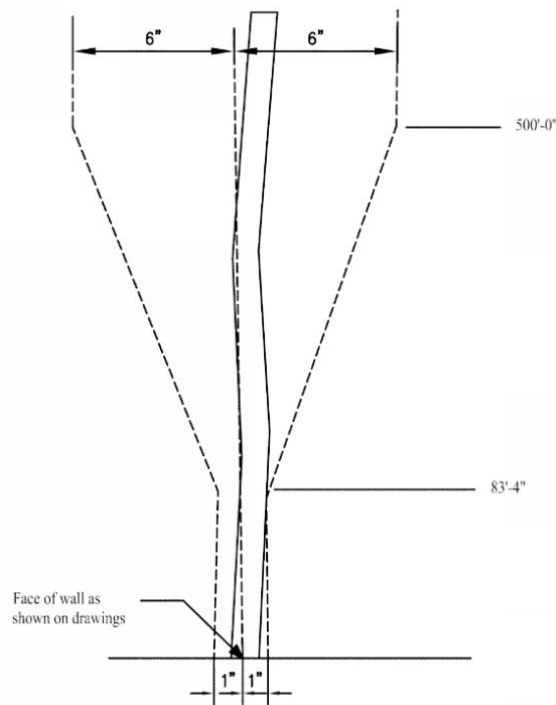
Horizontal Concrete Tolerance Envelope (ACI, 2010)
